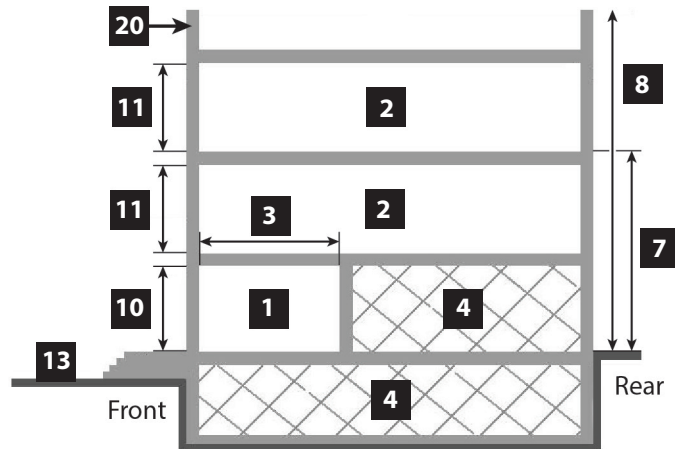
General building height and use diagram shown with basement and rear building interior parking, stoop entry type, and parapot roof type. Not to scale.
